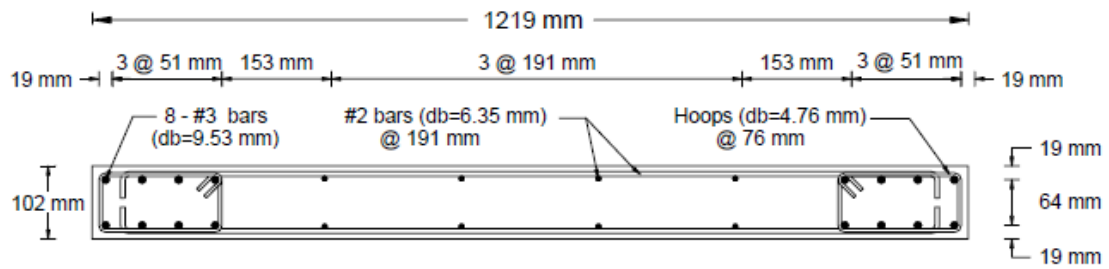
Cross-sectional view of the test specimen RW2 (Thomsen and Wallace, 1995).
